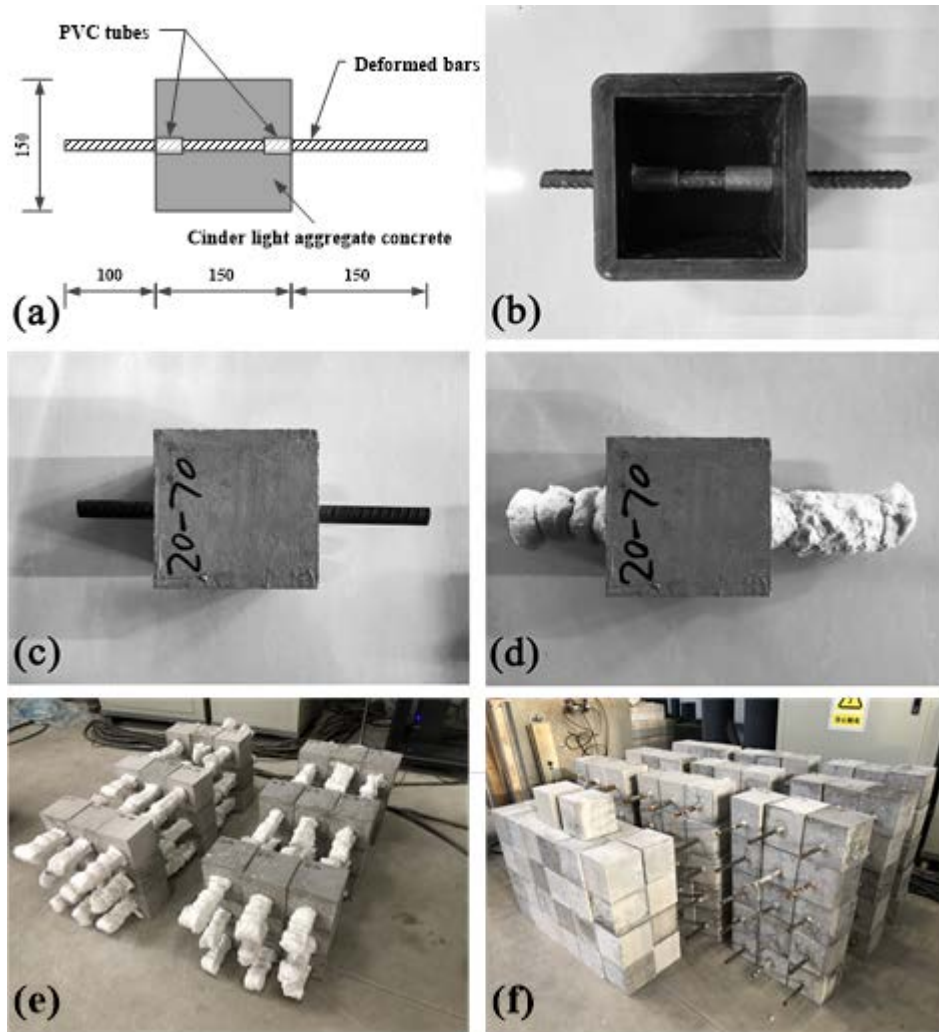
Specimens for pull-out test (unit: mm). (a) Dimension drawing of test block (b) Test block mold (c) Finished test block (d) test block after fireproof cotton treatment (e) part of test block after fireproof cotton treatment (f) all test blocks
